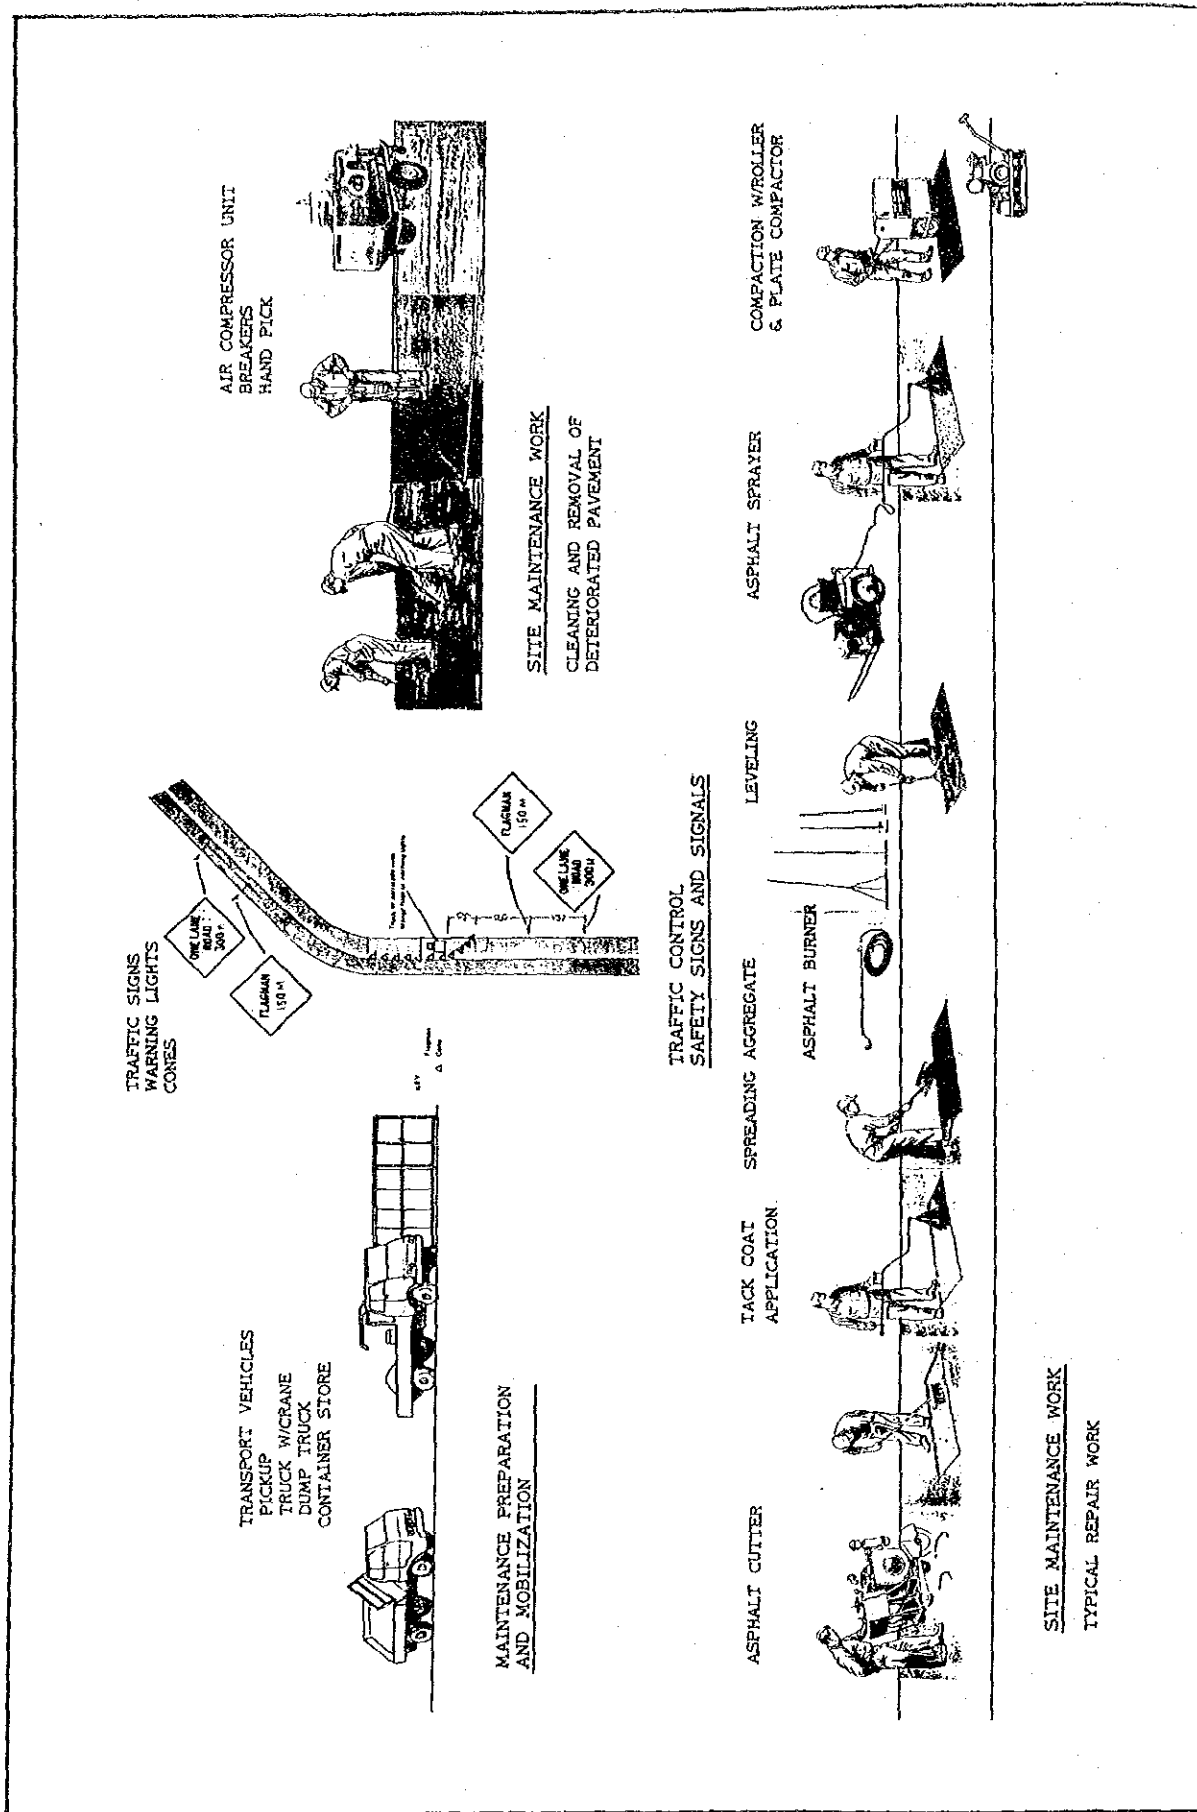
SITE MAINTENANCE WORK (TYPICAL REPAIR WORK)
